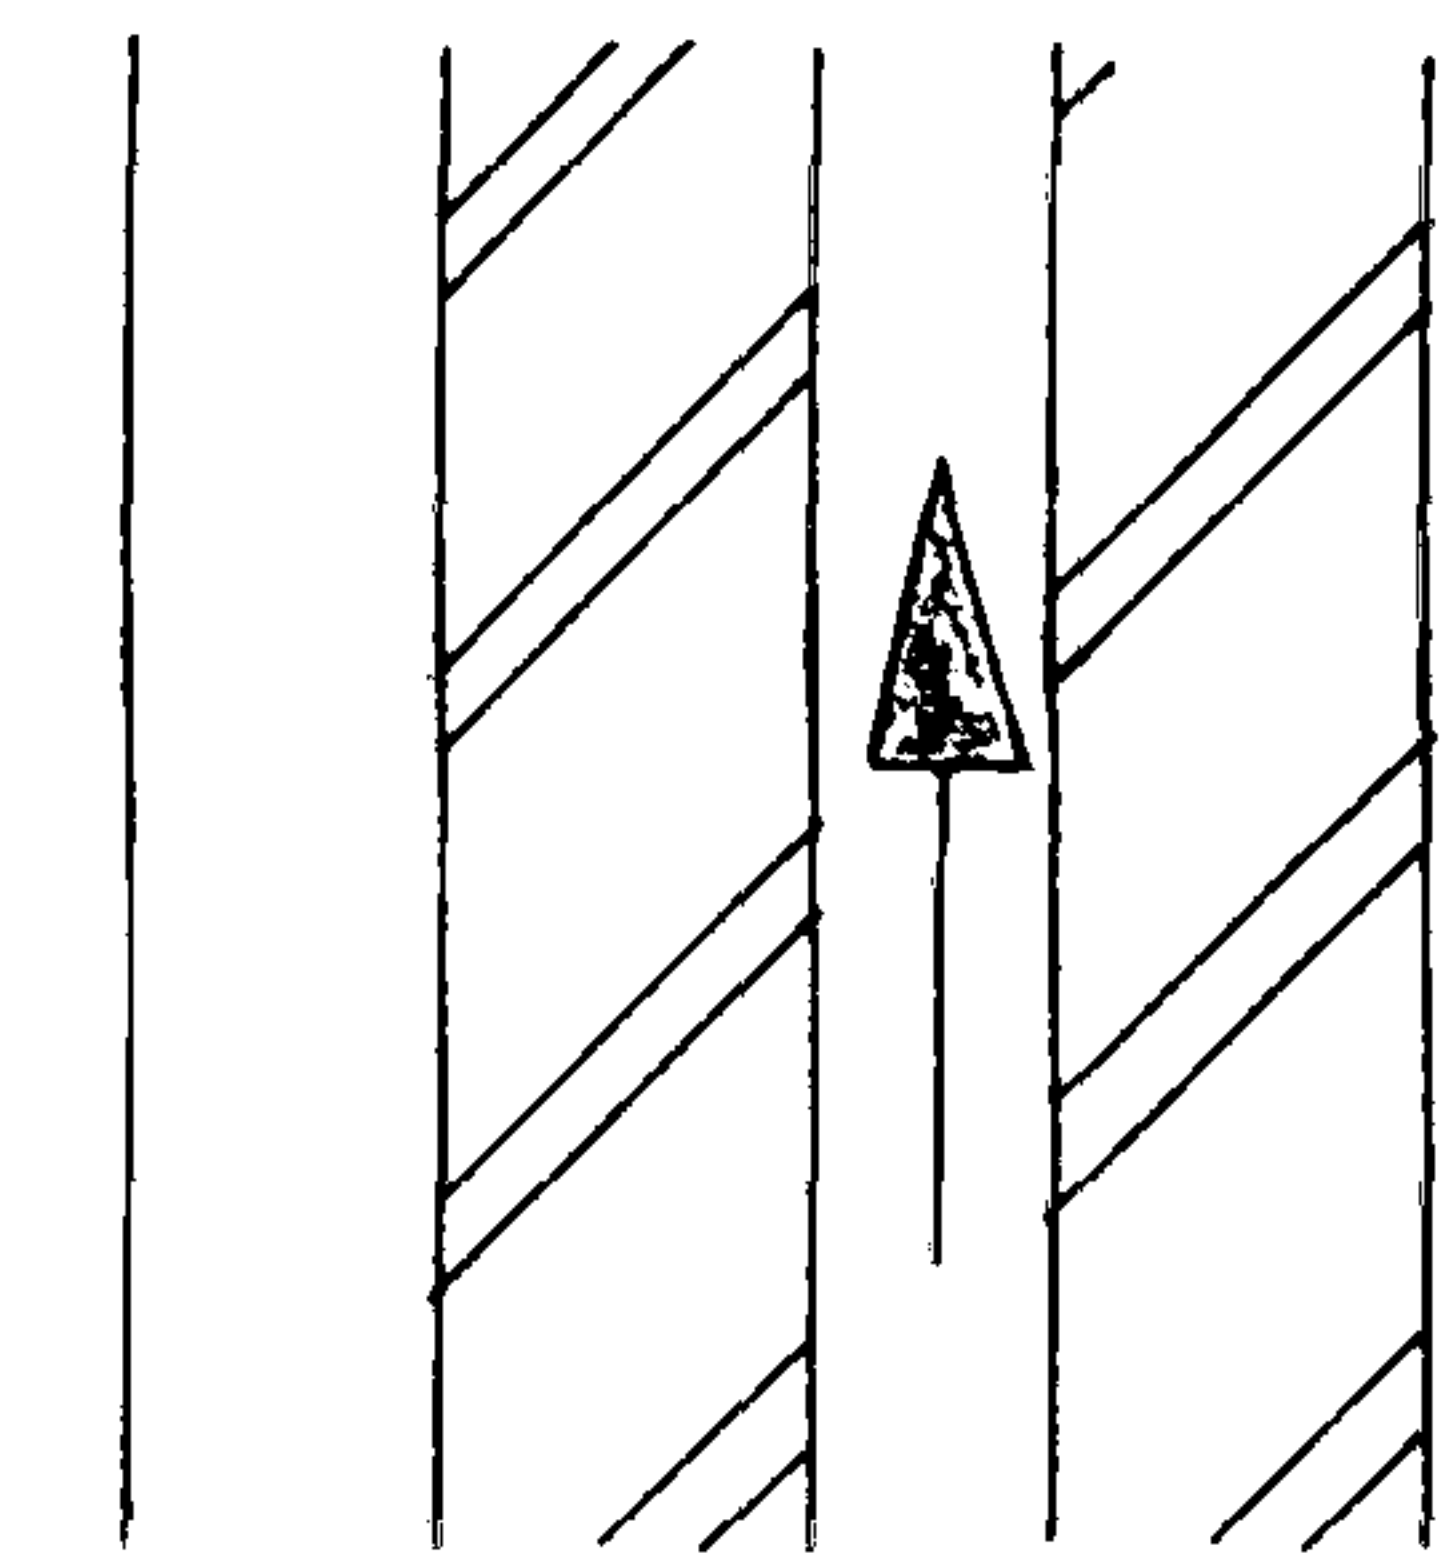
CAVITY BRICK WALL: SINGLE GLAZED AIR
